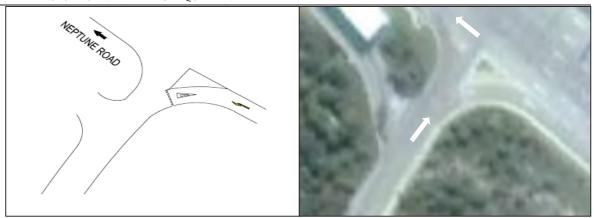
Geometric layout and aerial view of Neptune Road intersection
